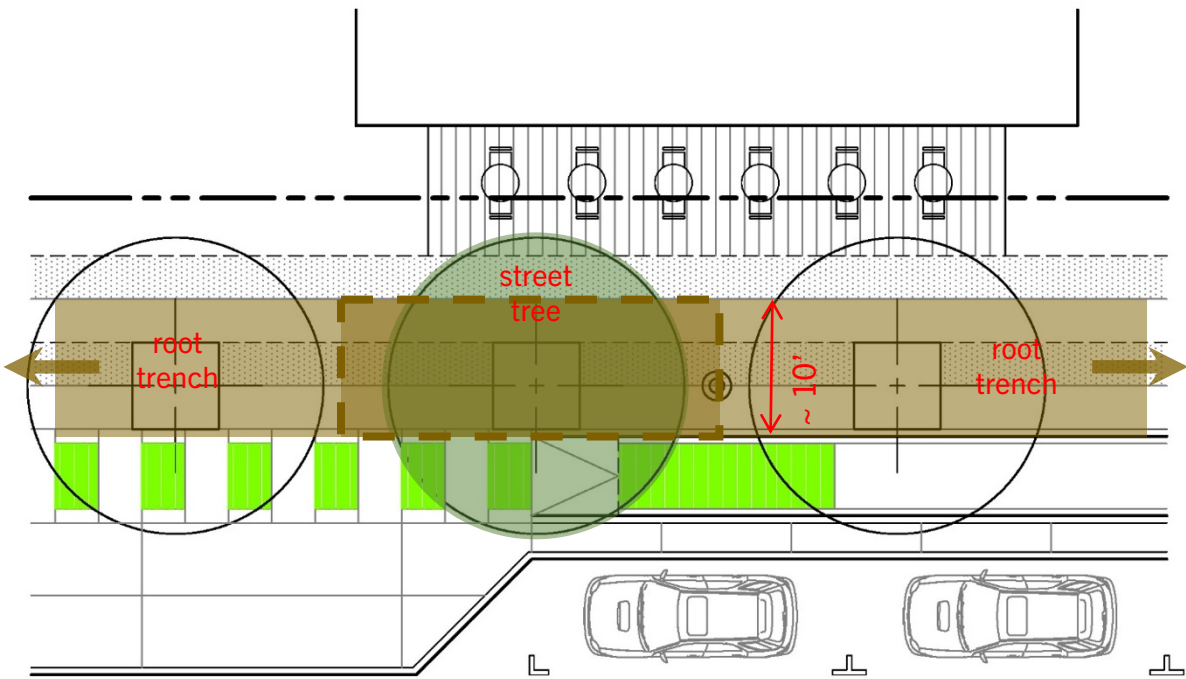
Compton Walk Landscape Infrastructure Systems.
